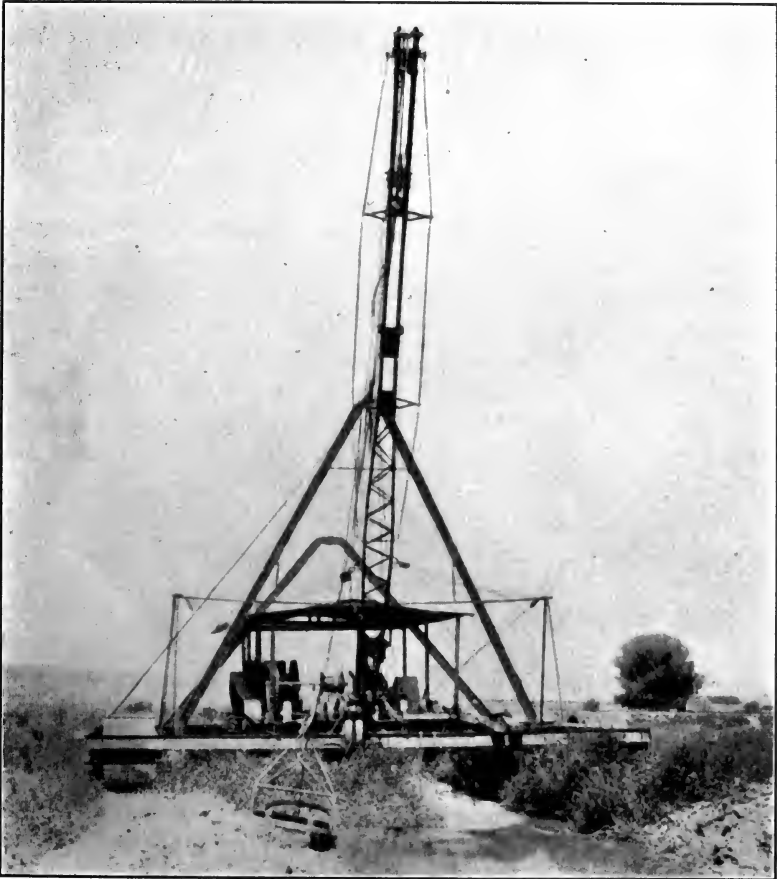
Light scraper excavator. (Courtesy of Economy Excavator Co.)
